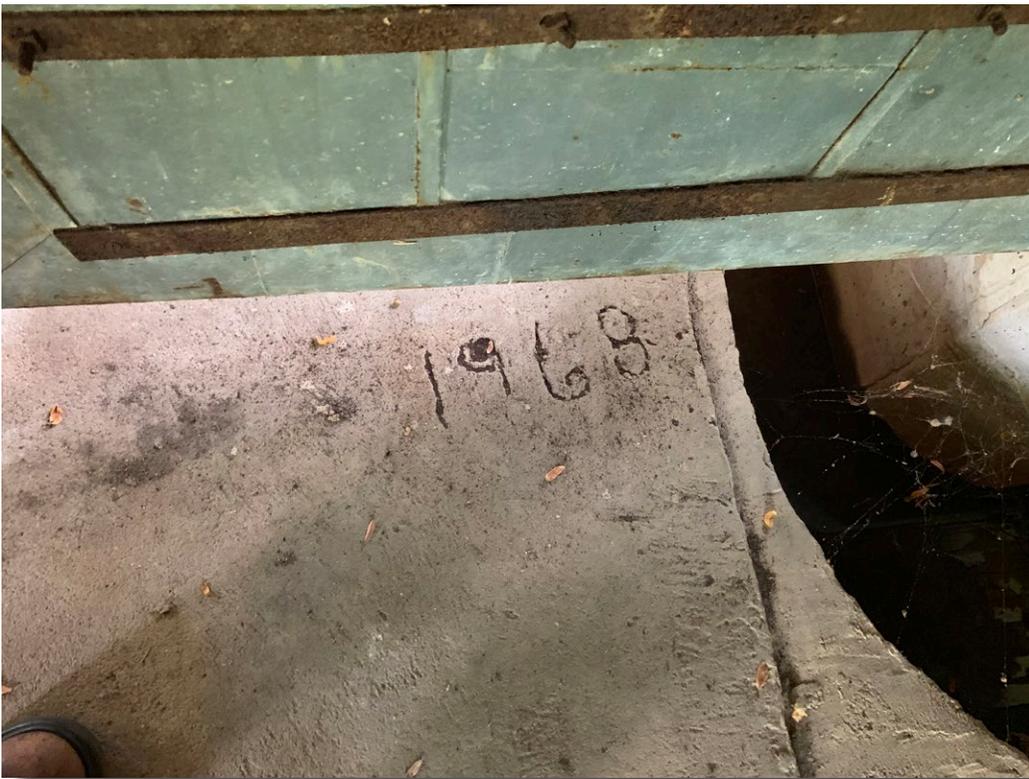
Detail of “1968” in the concrete floor in west end of Building 12 complex.
